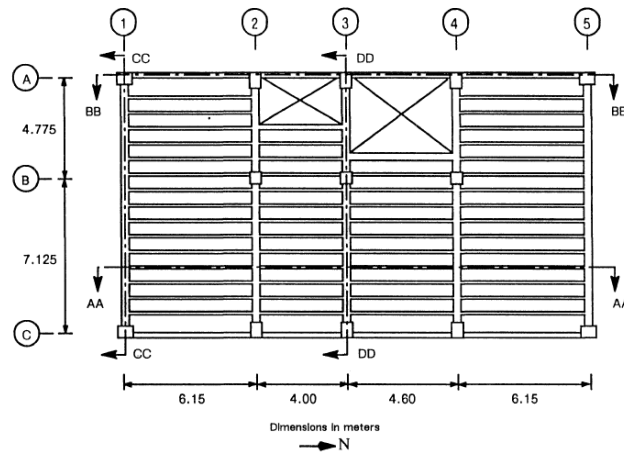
Plan view of floor system (Downs, et al., 1991)
